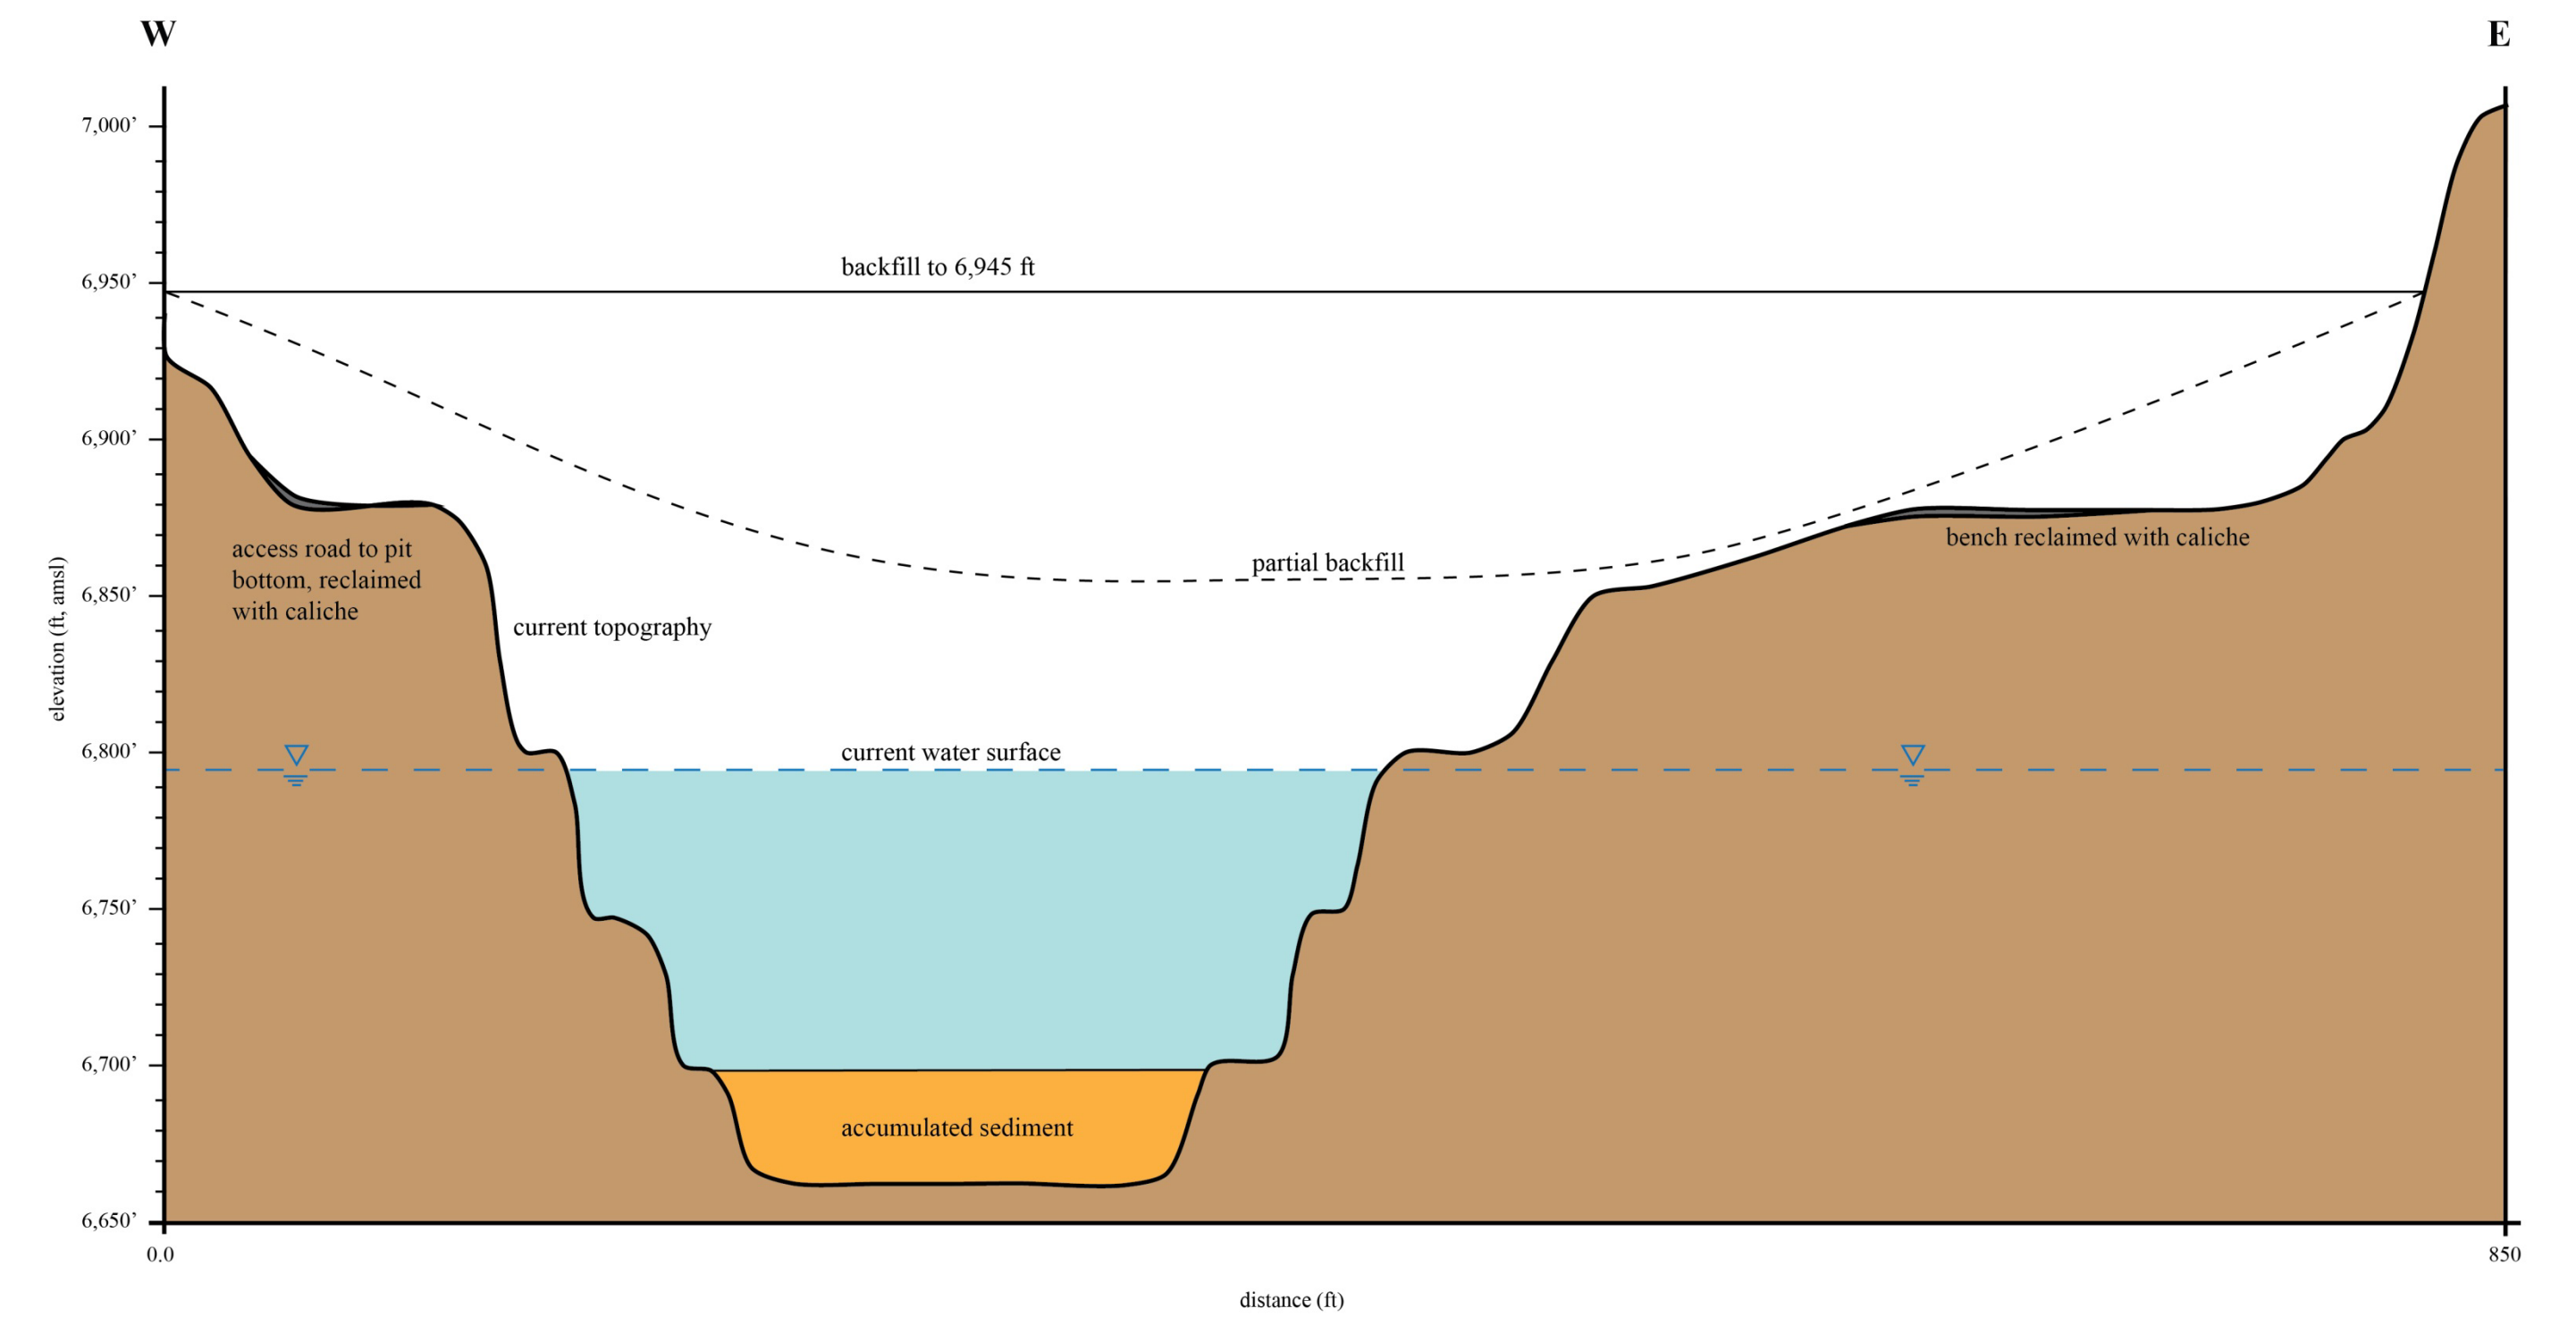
West-to-east cross-section schematic of the Cunningham Hill Mine Open Pit showing backfilling options.
